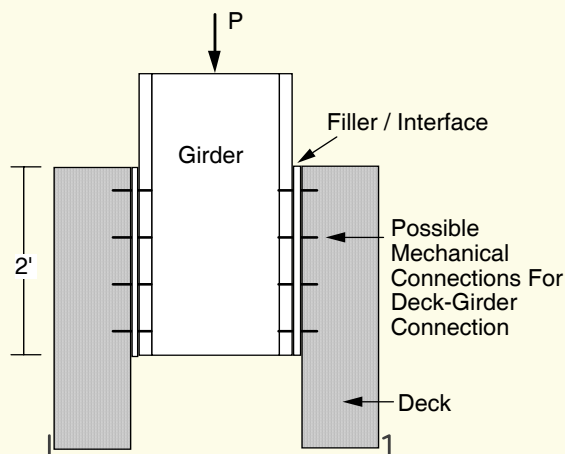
Schematic of Test Set-up for Sample Deck-to-Girder Connection
